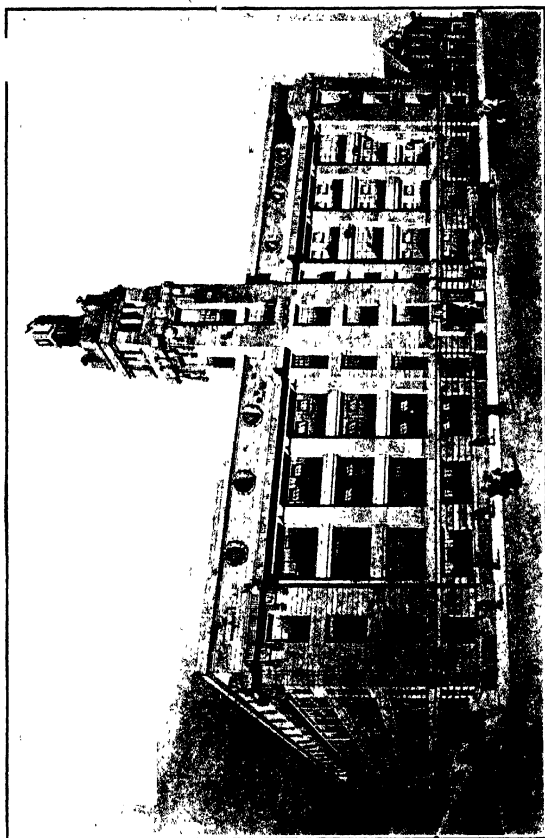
Proposed factory. (Wallis Gilbert & Partners, Architects.)
